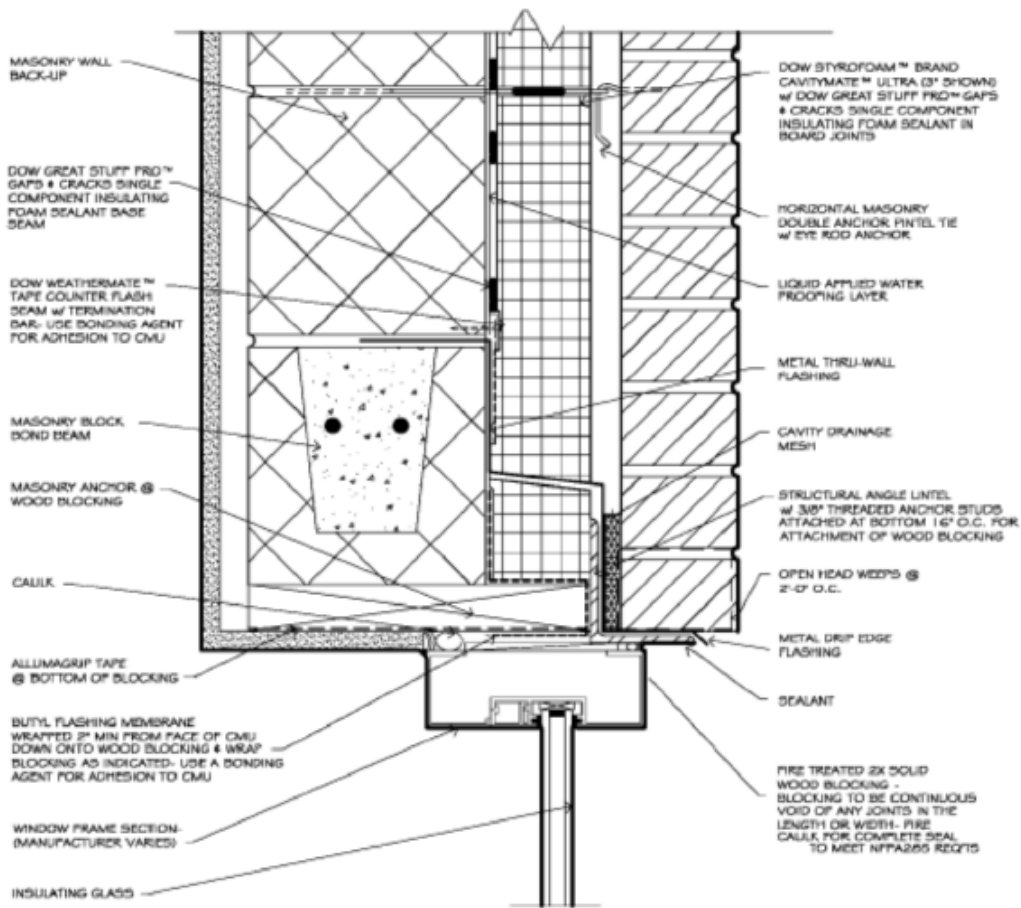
WINDOW HEAD DETAIL—FRTW WOOD BLOCKING—MASONRY WALL
